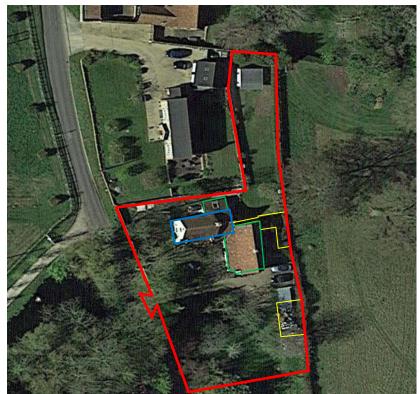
Aerial photo of site plan (not to scale) showing site (outlined red), historic building (blue) and more modern additions (green) and location of proposed works (outlined yellow), from North to South (North is up the page):
